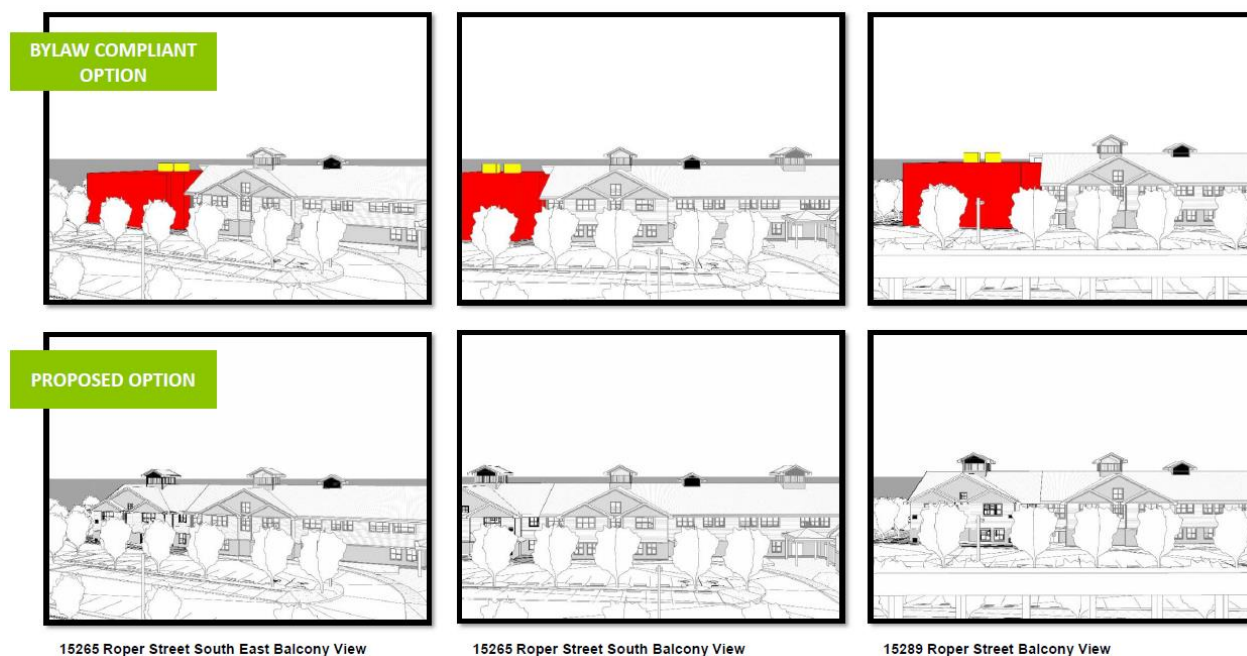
View Analysis Illustrating permitted building height (flat roof on top) against proposed, pitched, roof design
